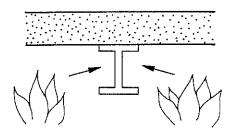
Flames penetrating between the supporting steel beams after a failure of the suspended ceiling
